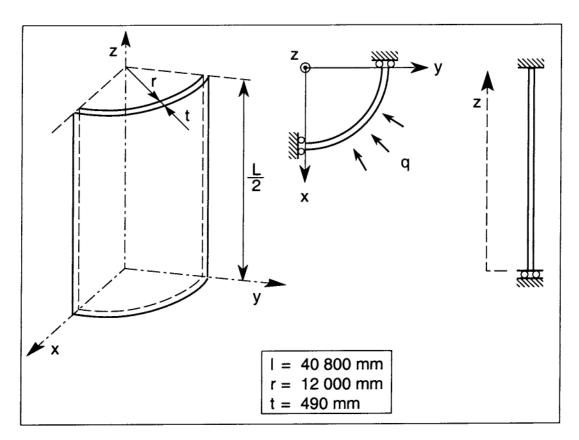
Cylindrical wall. Geometry and edge conditions
